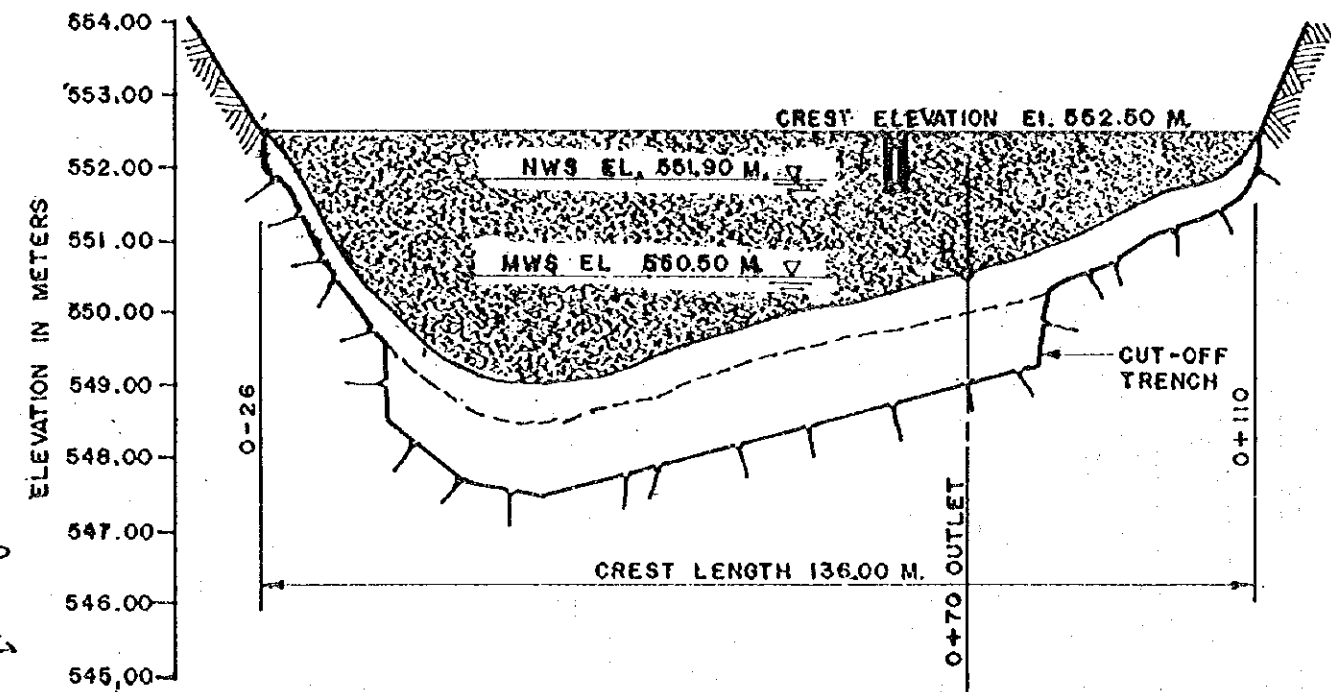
PLAN OF FARM POND IN SILAE ARC (DALACUTAN AREA)
